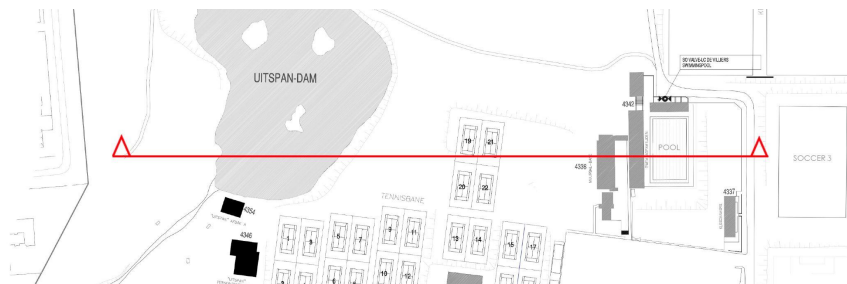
Site plan showing where sectional sketches are drawn (Author, 2021)
